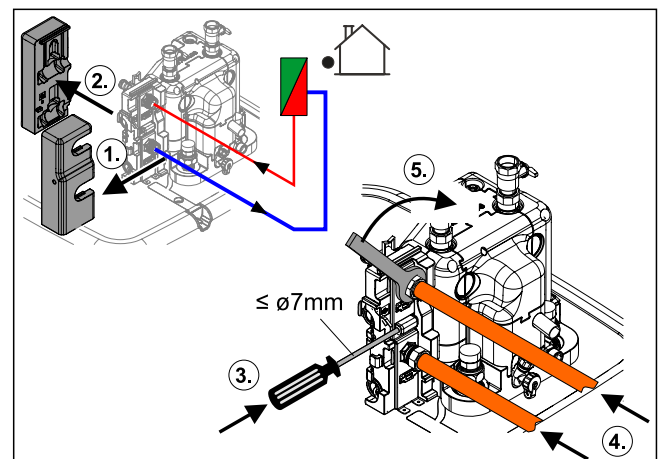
Establishing the hydraulic connection to the outdoor unit
